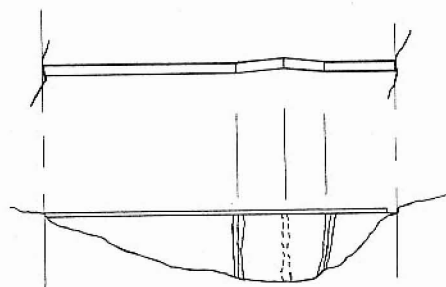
Plan and elevation of the failure of 1884 (not to scale)
